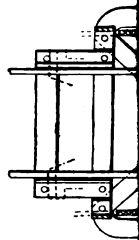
SPECIAL WORK AT CROSSING OF TWO CENTRE SLOT CONDUIT ROADS.
